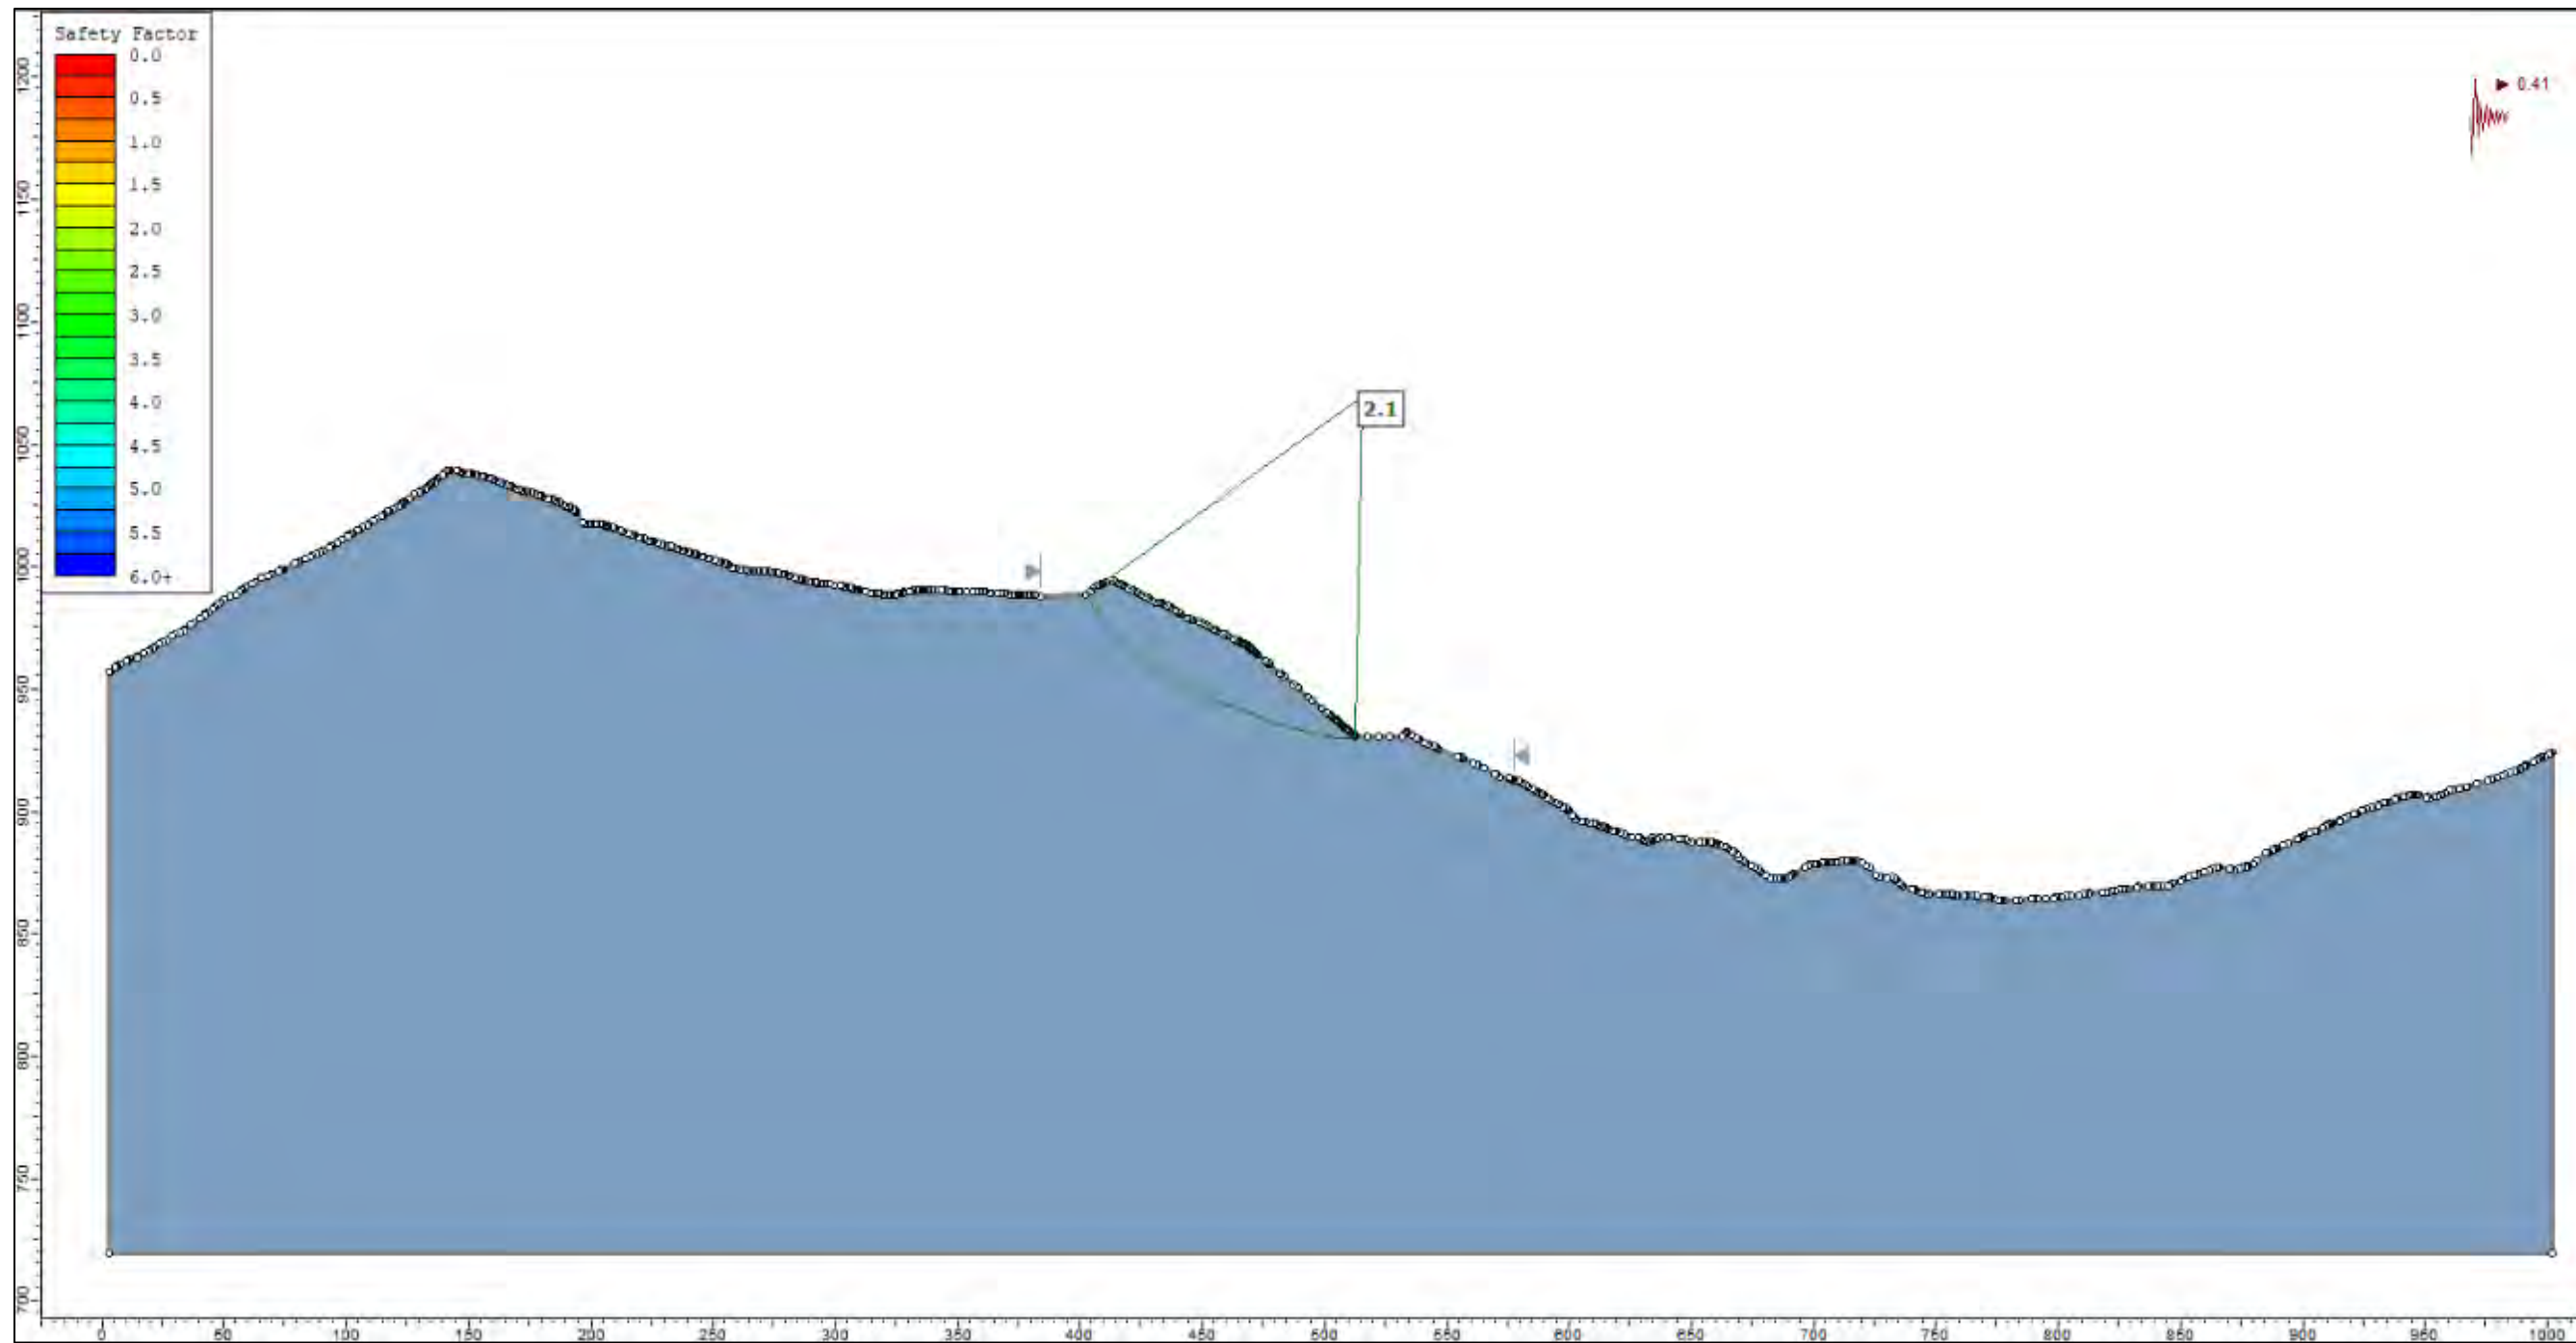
Haul Road Cut - Section 108 – ULS Conditions.
